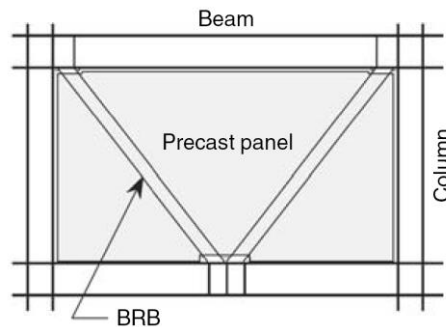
Buckling Restrained Braces sandwiched between precast concrete panels [30]
